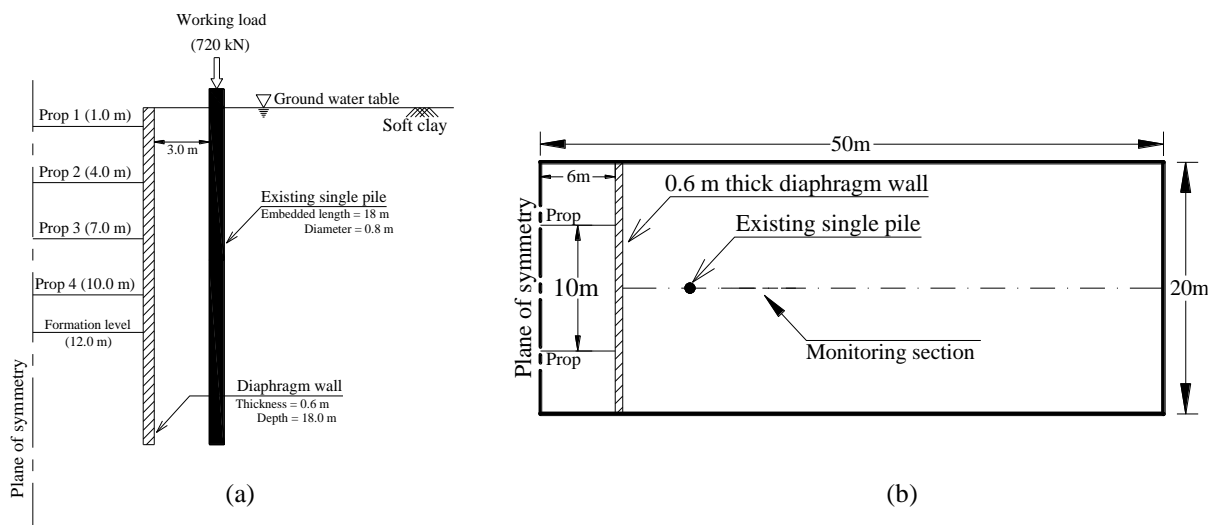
Configuration of a typical numerical run representing case of S; (a) elevation view (b) plan view
